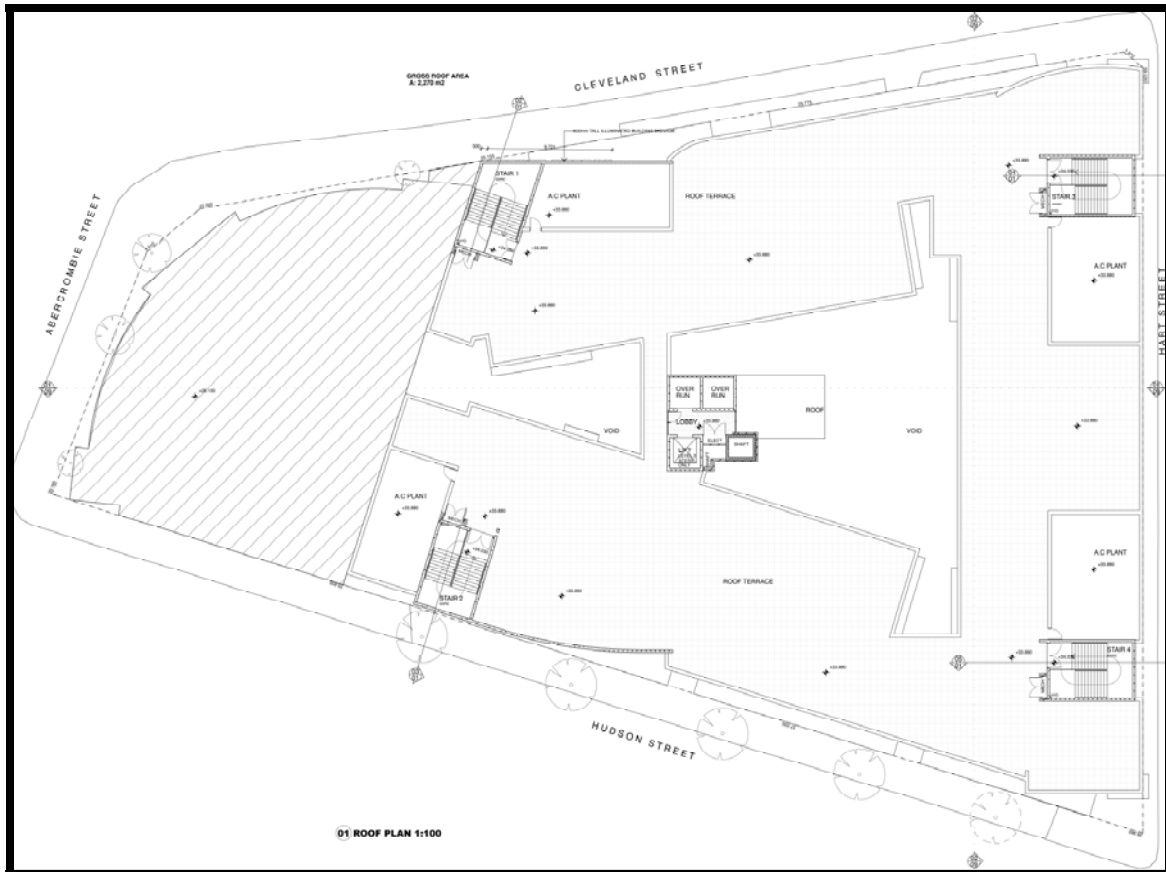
Roof plan of proposed development (not to scale). (Source: Fortey + Grant Architecture, 2010)
